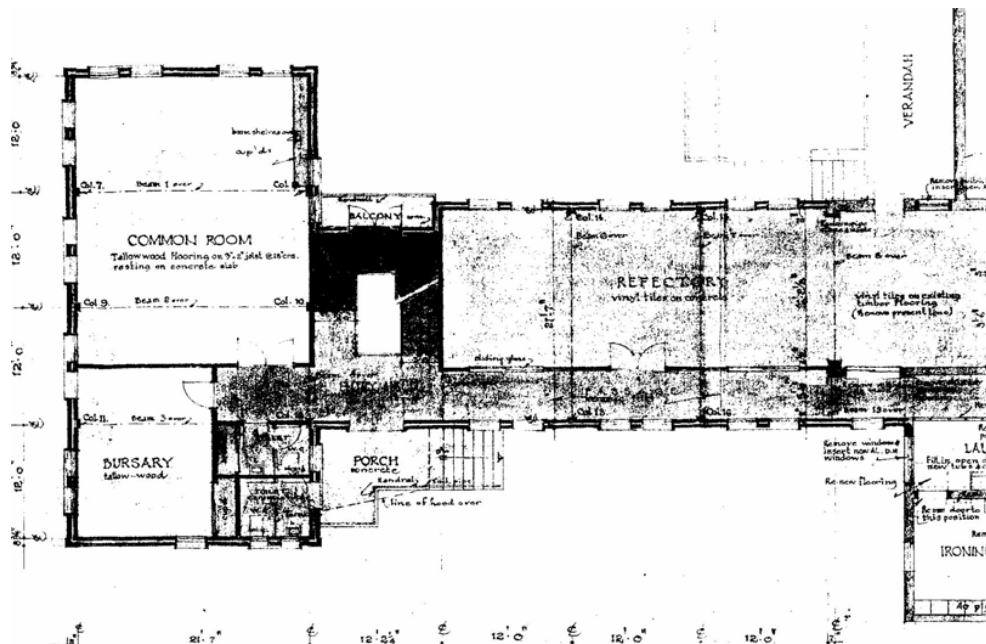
Architect's 1961 plan of the ground floor of the St Joseph's Mount Novitiate. (Sisters of Mercy, Bathurst Congregation)
